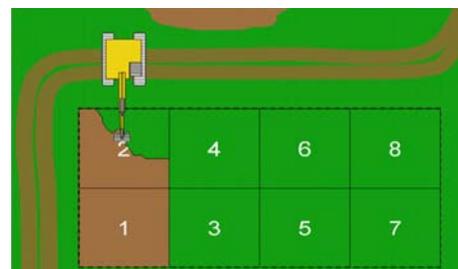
Stage excavation so that it can be done without compacting the subgrade.
